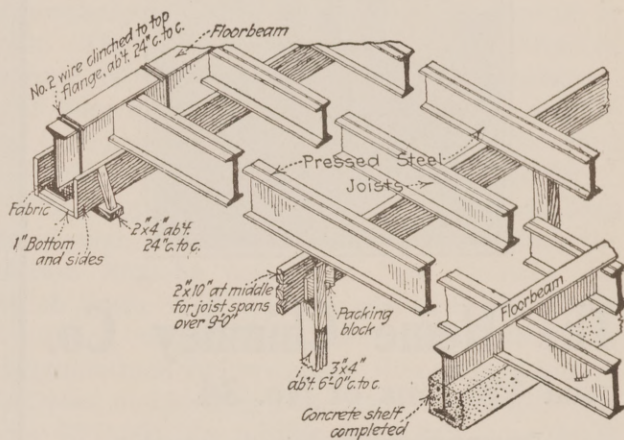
CONCRETE SHELVES SUPPORT NEW JOISTS.
